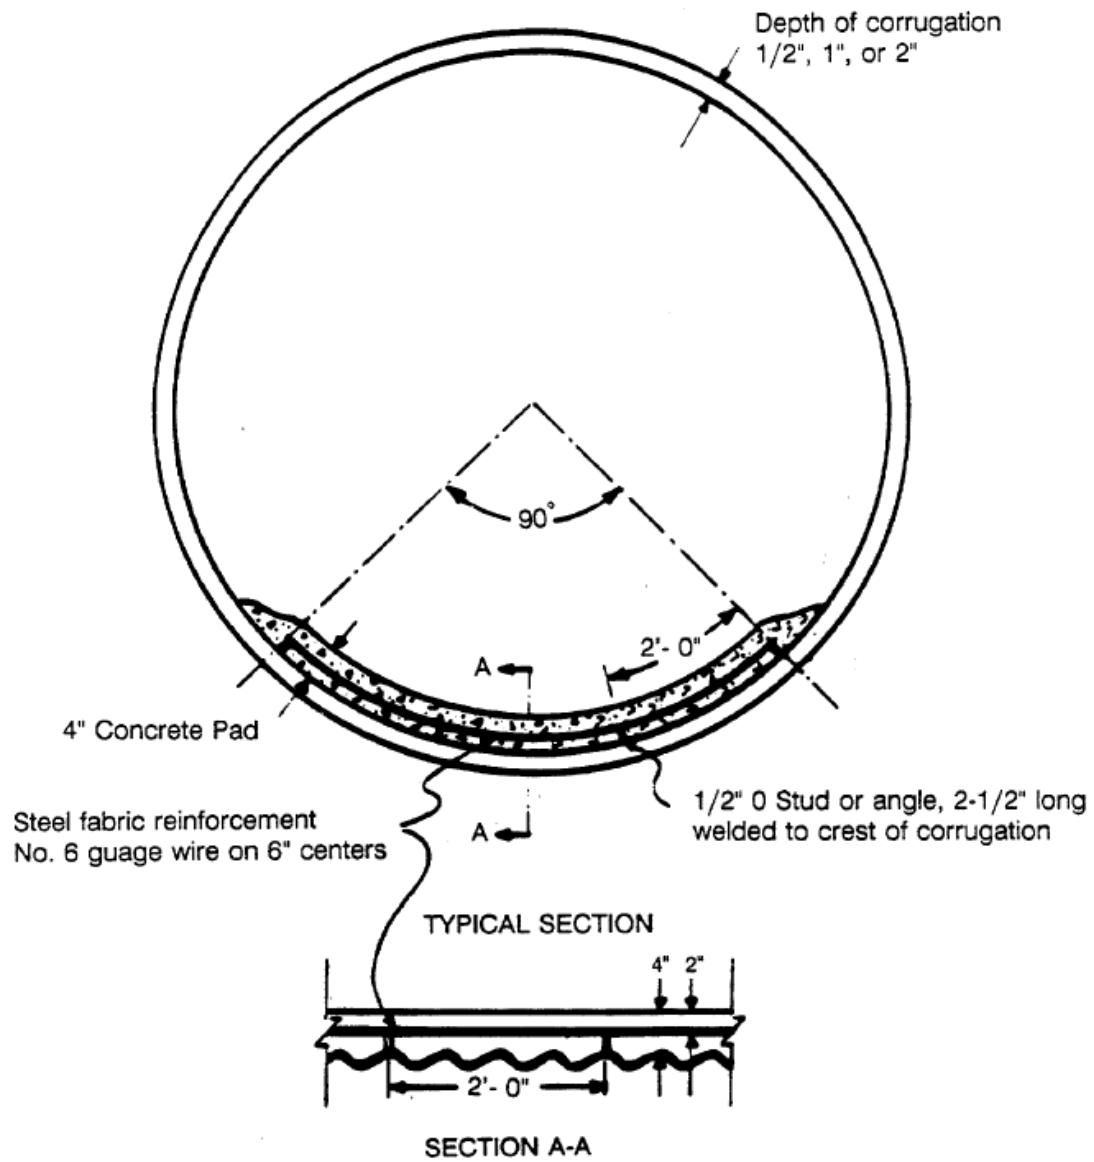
Reinforced concrete invert paving for corrugated metal pipes (FHWA 1995).
